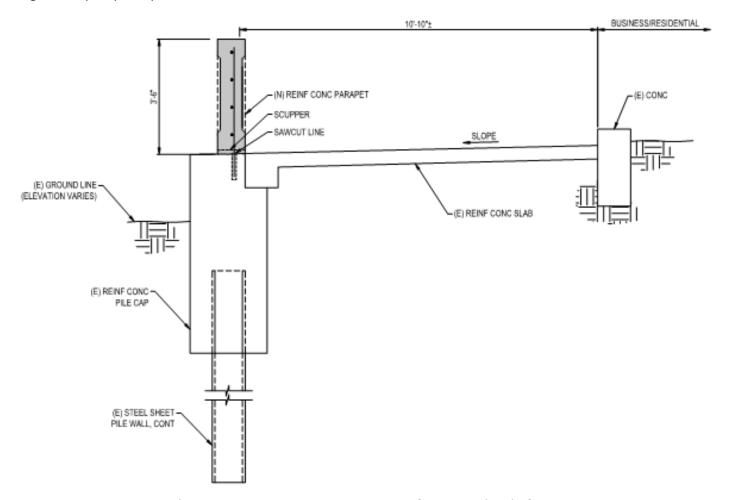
Segment B - Parapet Replacement-in-Kind
